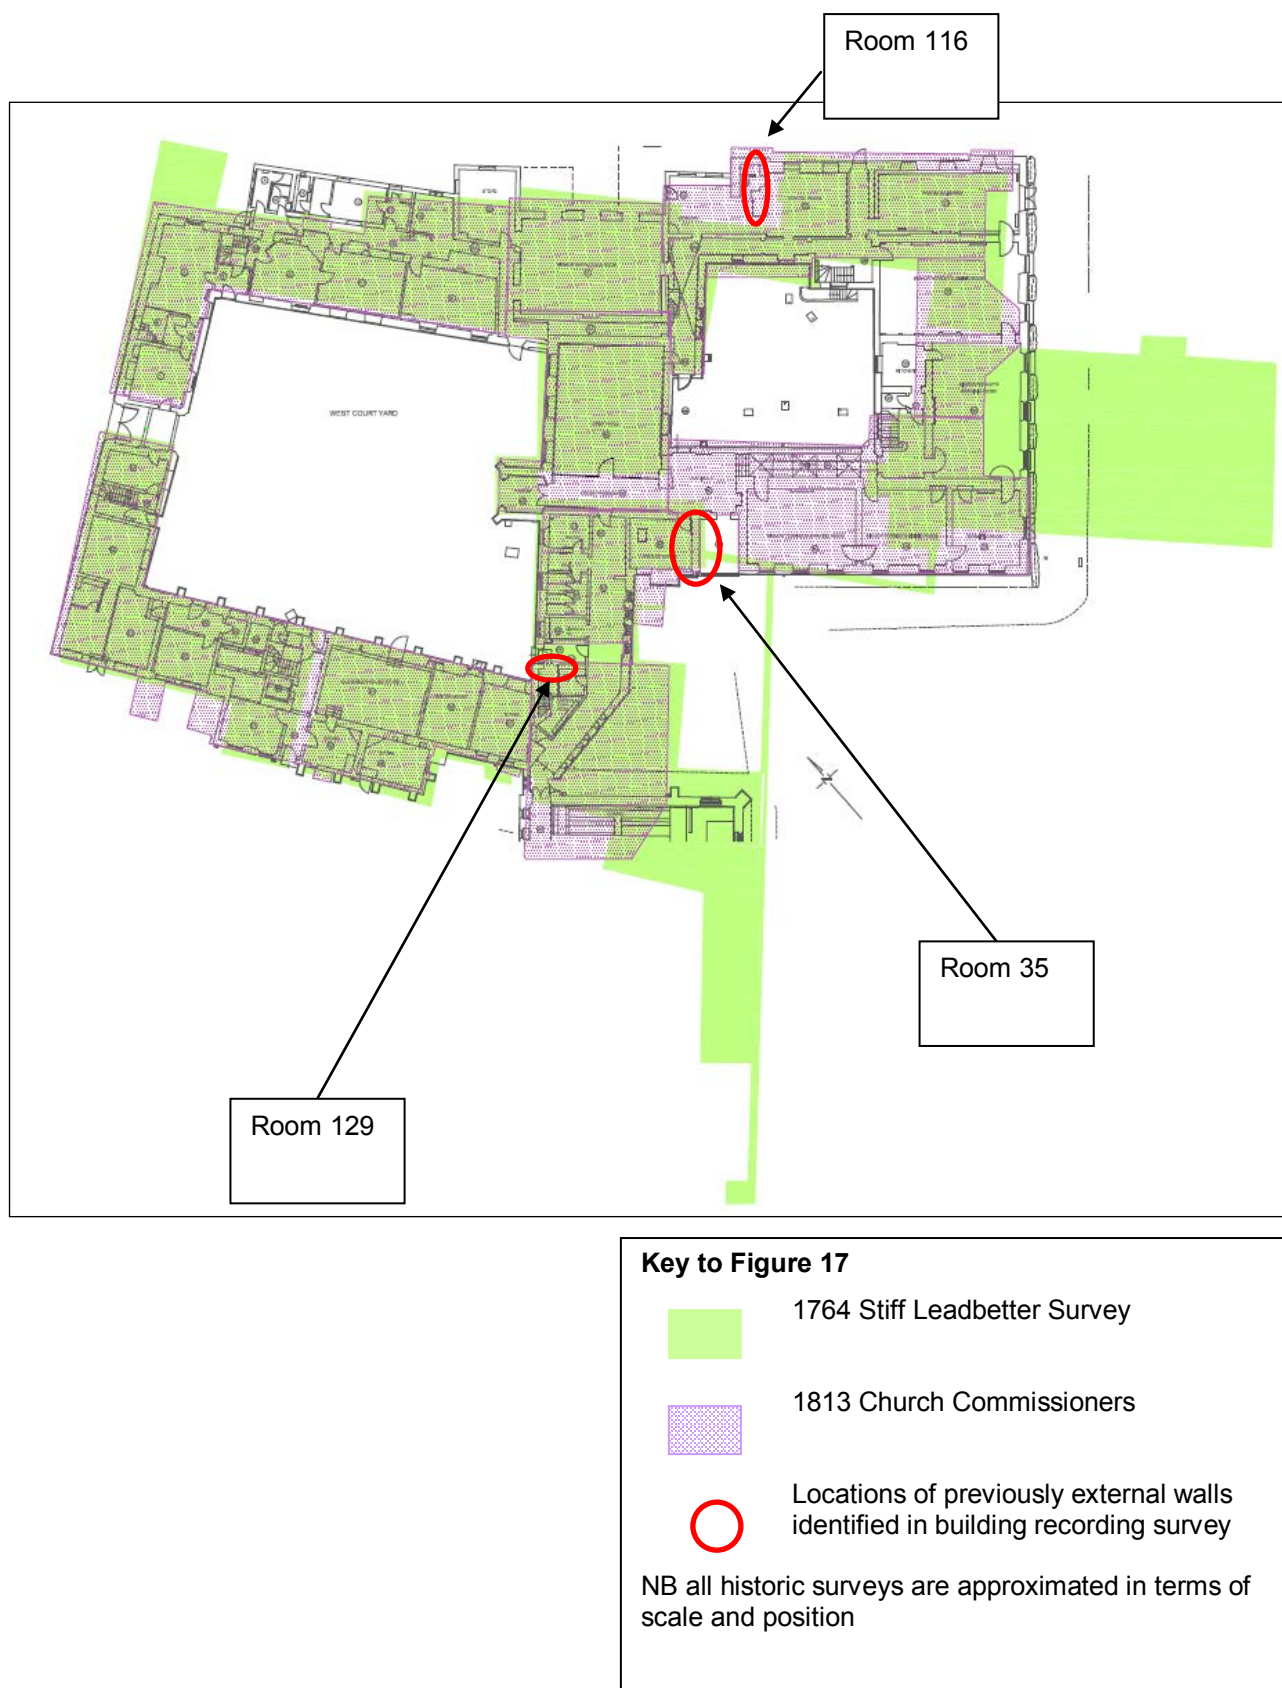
Overlay of current floor plan with 18th- and 19th-century surveys
